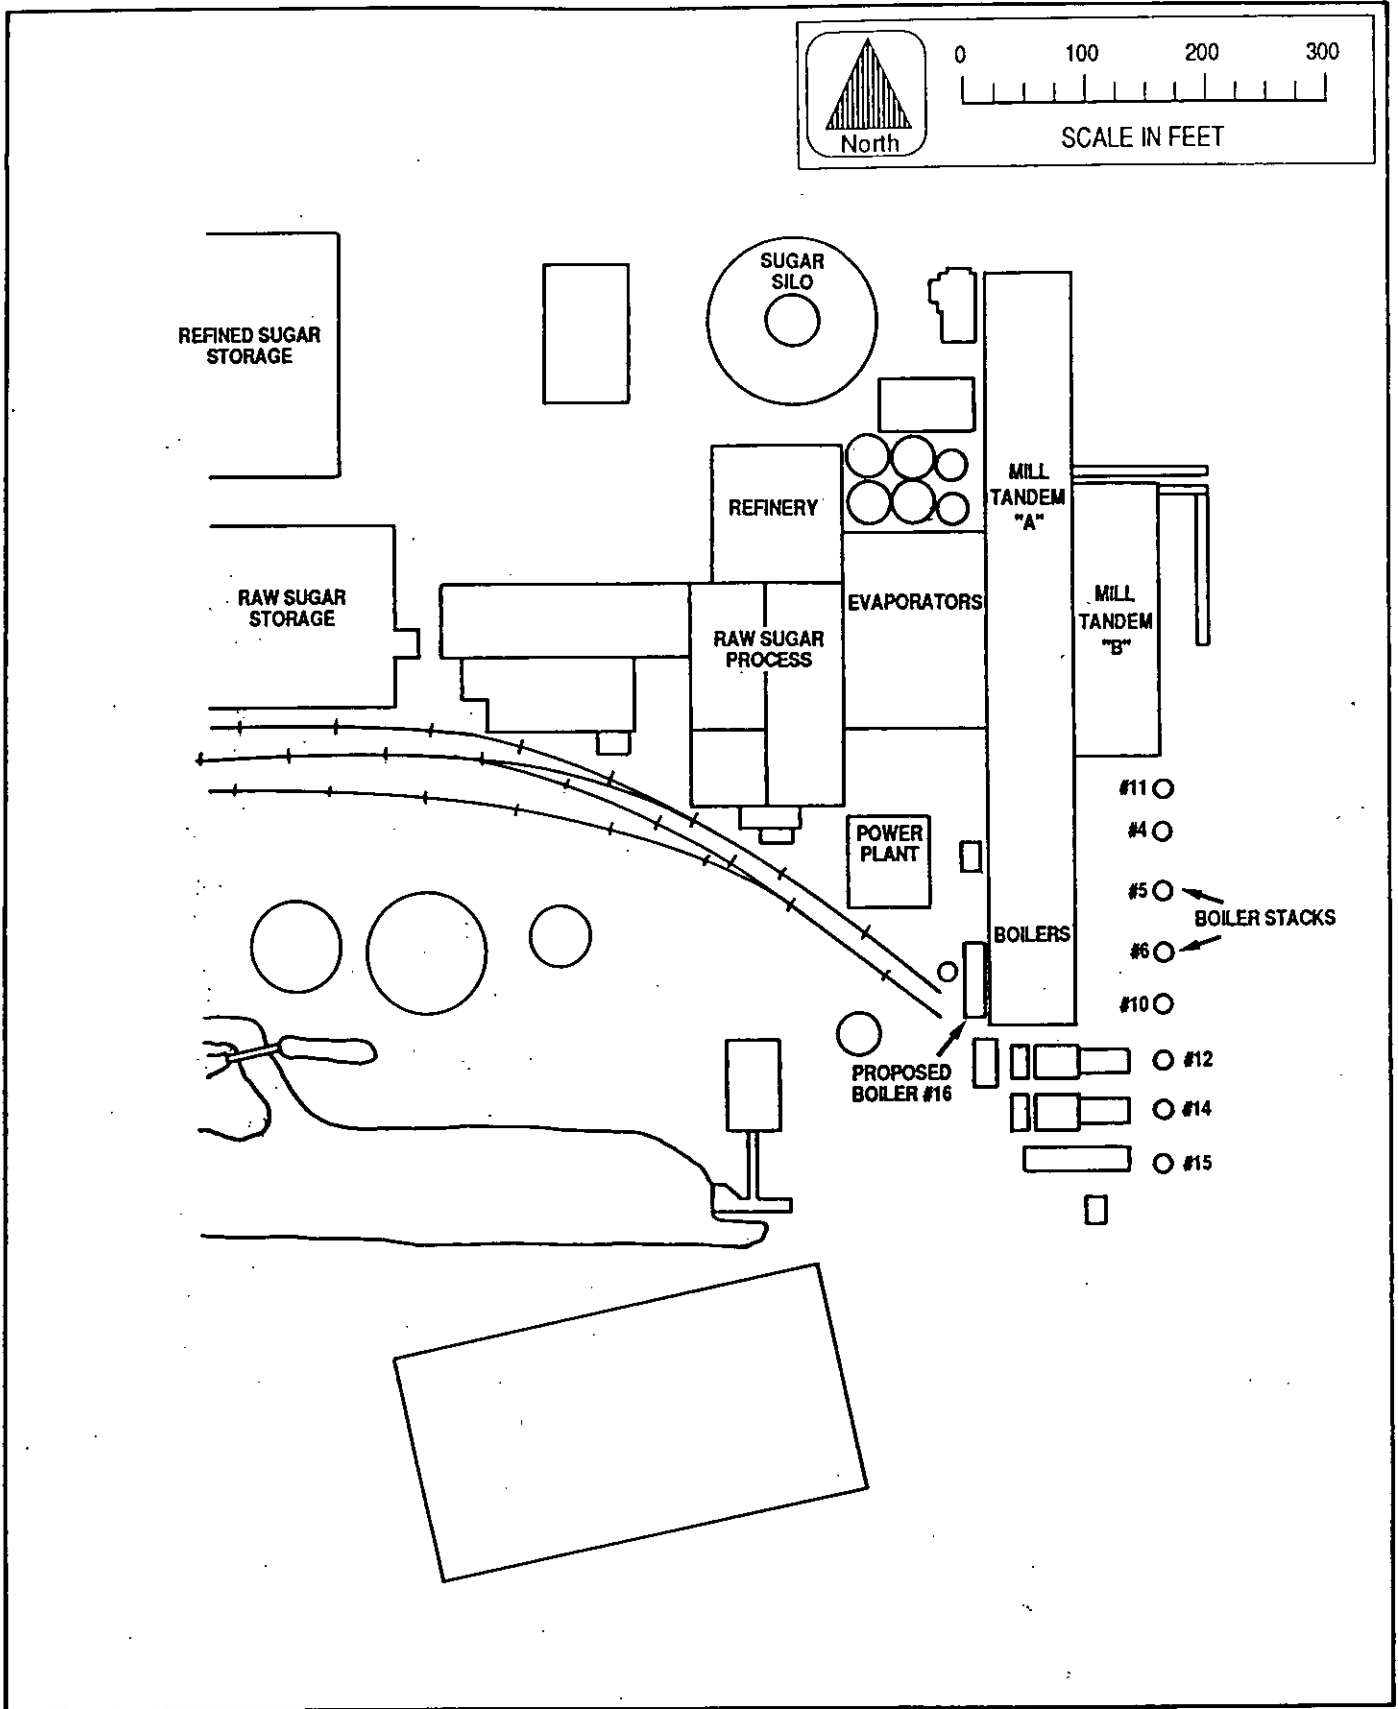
PLOT PLAN OF OKEELANTA SUGAR MILL
